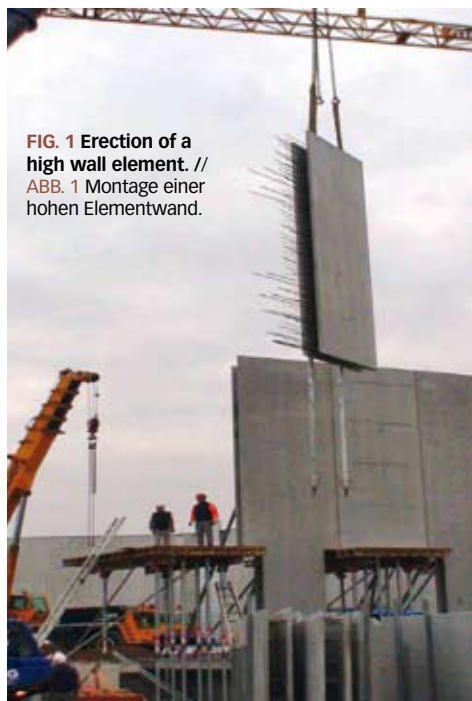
Erection of a high wall element. // ABB. 1 Montage einer hohen Elementwand.
